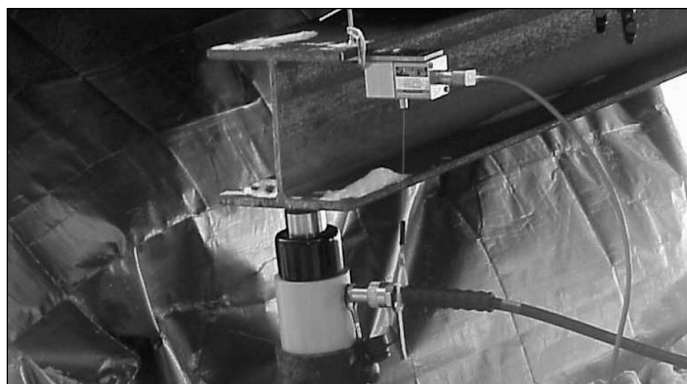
, Alternative method of stroke sensor mounting to prevent excessive amounts of water from running down the sensor cable in raining or snowing conditions.
